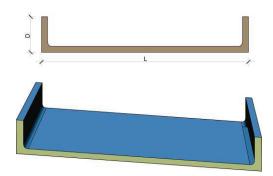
The scheme "blades" of a prefabricated shallow bed of the pool without a roof base reinforcement.
